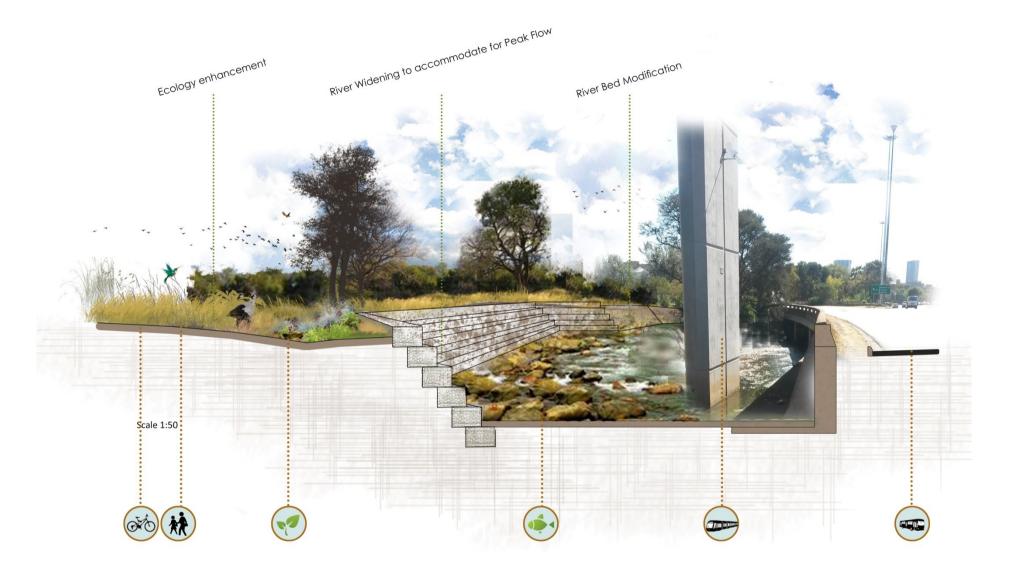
Plan of Scenario 3\_River Widening with Terramesh (Author 2014)
